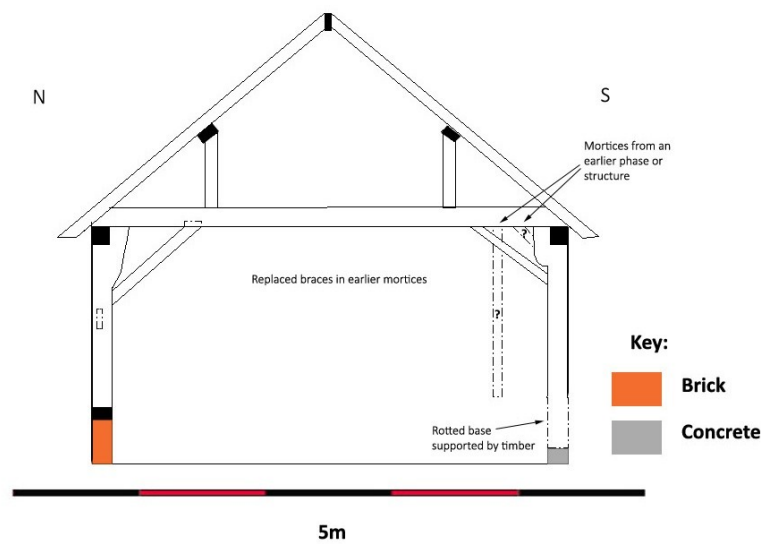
Sketch of the ground floor north elevation of the Mint House.
